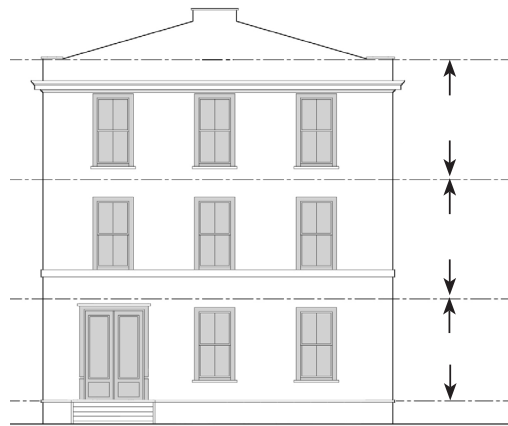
FAÇADE TRANSPARENCY REQUIREMENTS FOR BUILDINGS WITHOUT SHOPFRONT.
